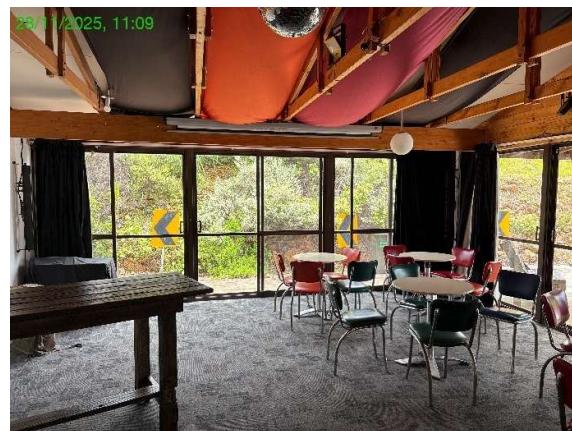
The same sliding door/window frame configuration has been used to all large opening.
